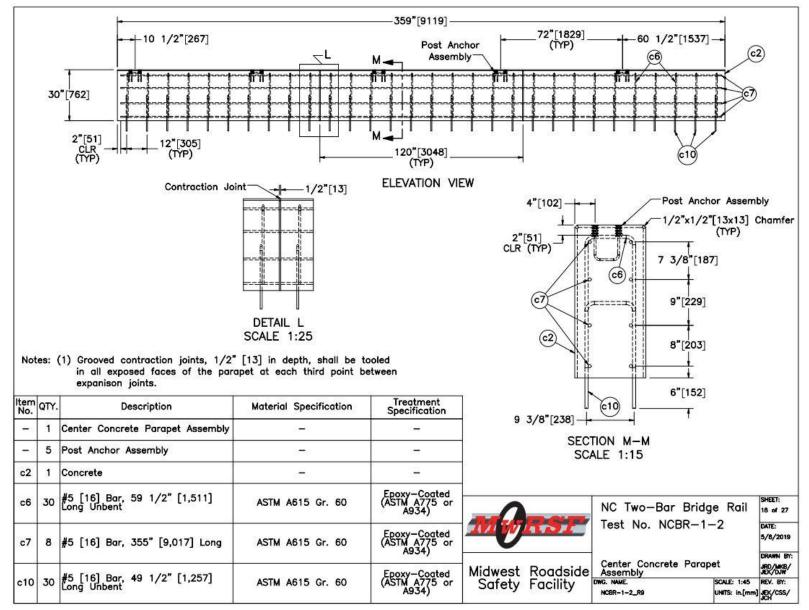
Center Concrete Parapet Assembly, Test Nos. NCBR-1 and NCBR-2
